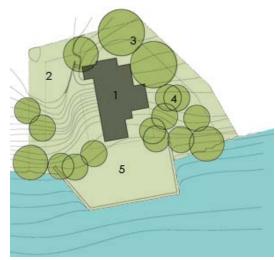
Site Plan - 1. House 2. Parking 3. Garden 4. Garden 5. Front Lawn
